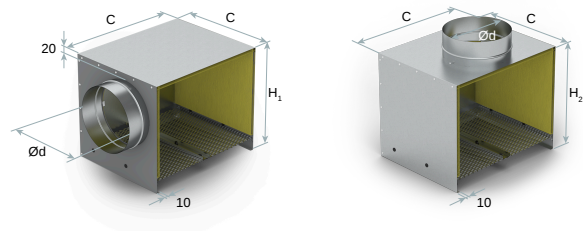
Dimensions of SR rectangular plenum boxes for NS5-K panels.
